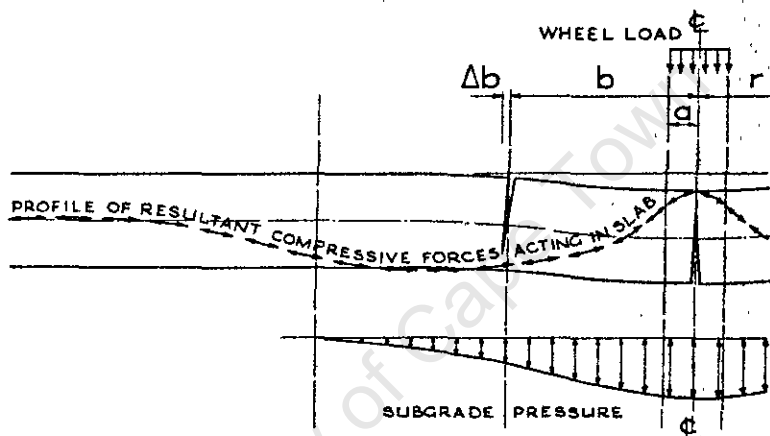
HALF SECTION THROUGH SLAB WITH EXAGGERATED VERTICAL SCALE
